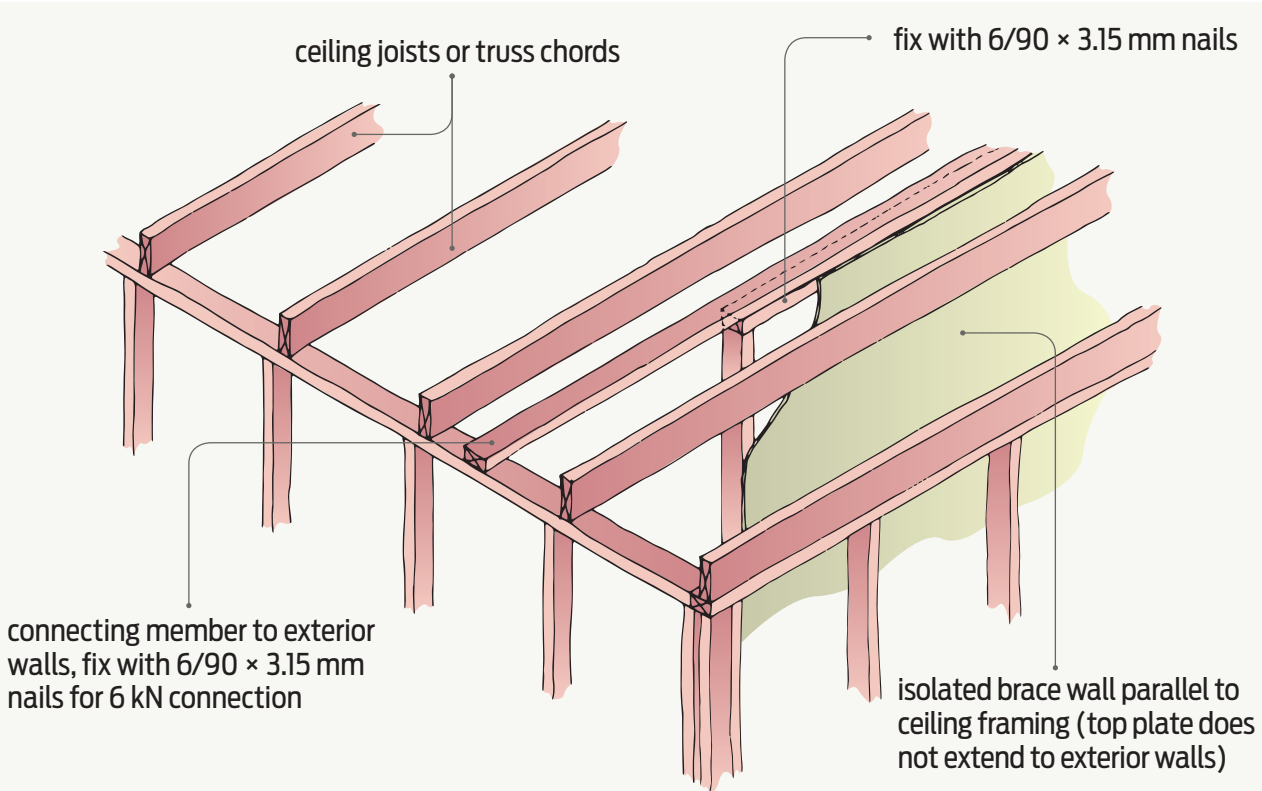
Brace wall connection when wall is parallel to ceiling framing.
